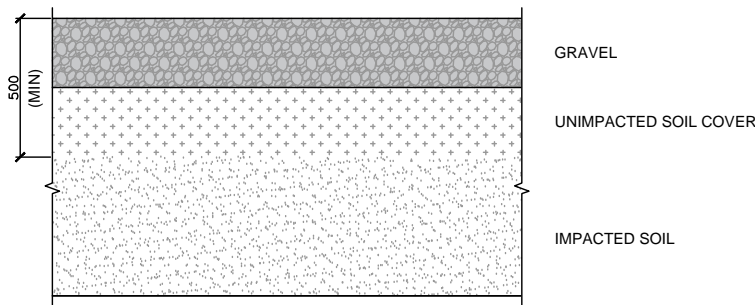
B SOFT CAP CONSTRUCTION - SERSON CREEK CORRIDOR NTS
